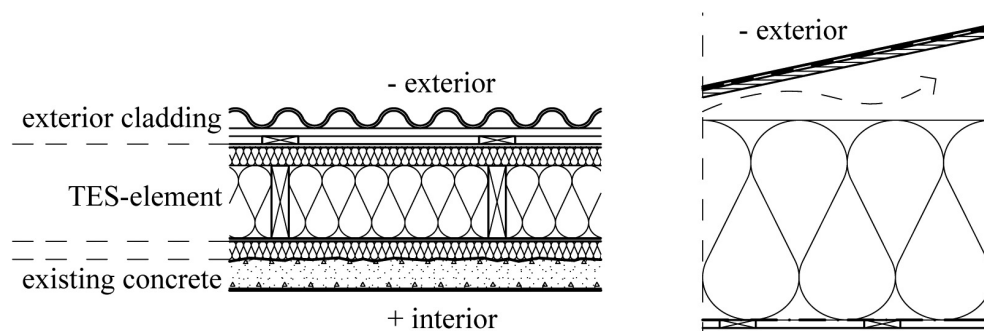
Façade and roof structure after refurbishment. Outer façade layers were removed leaving the inner concrete layer in place. A new façade was retrofitted with prefabricated timber based elements. The U-value of the finished wall is $0.11 \text{ W/m}^2\text{K}$. The old roof was completely replaced, adding 550 mm thermal insulation, resulting in a U-value of $0.08 \text{ W/m}^2\text{K}$. The external wall structure from the outside: cladding, 22+22 mm air gap, 9mm wind barrier GU 9, 50 mm thermal insulation layer, 200 mm thermal insulation layer, 9 mm plywood board, 50 mm thermal insulation (adjustment layer), old inner concrete layer. The thermal insulation is glass mineral wool. Images: Simon le Roux.
